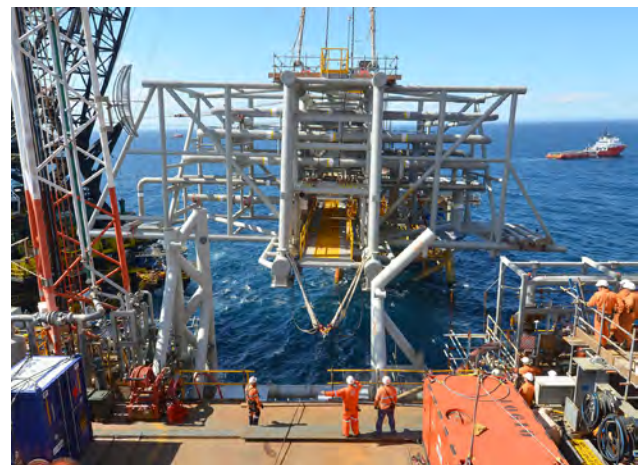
Lifting the bridge between Marlin A and Marlin B platforms into position.
